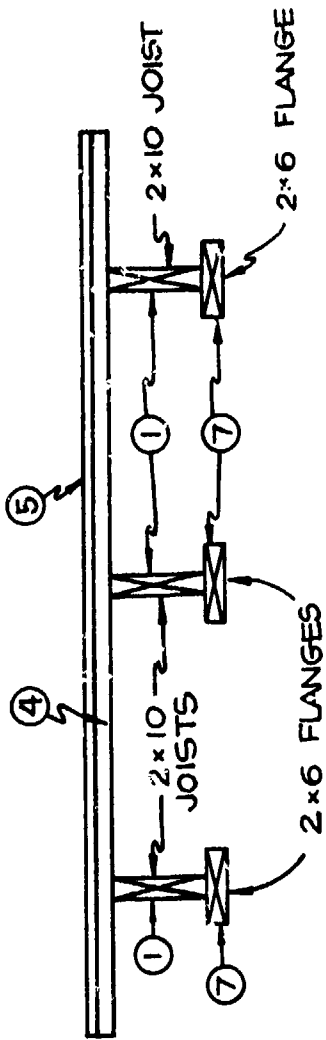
Construction Details for Floor Panels 3 and 6.
